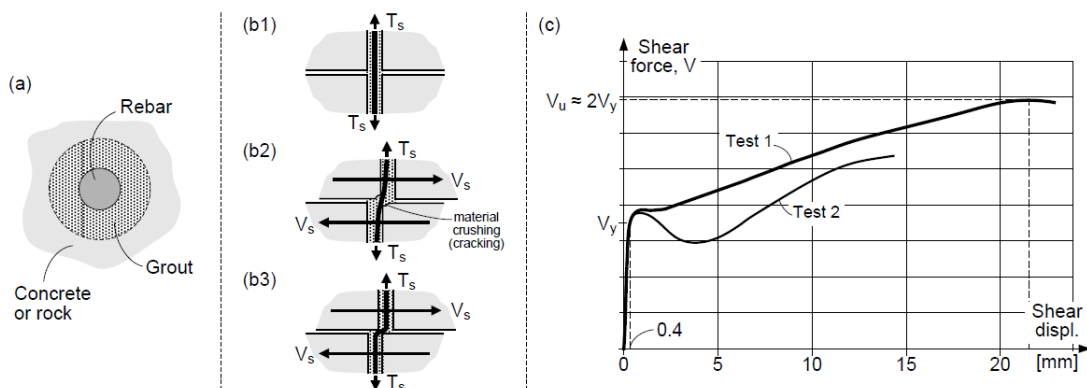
(a) grouted anchor in concrete, (b1) tensile failure, (b2) cracking of material, (b3) tensile-shear failure and (c) shear force-displacement diagram of a passive anchor [6]
